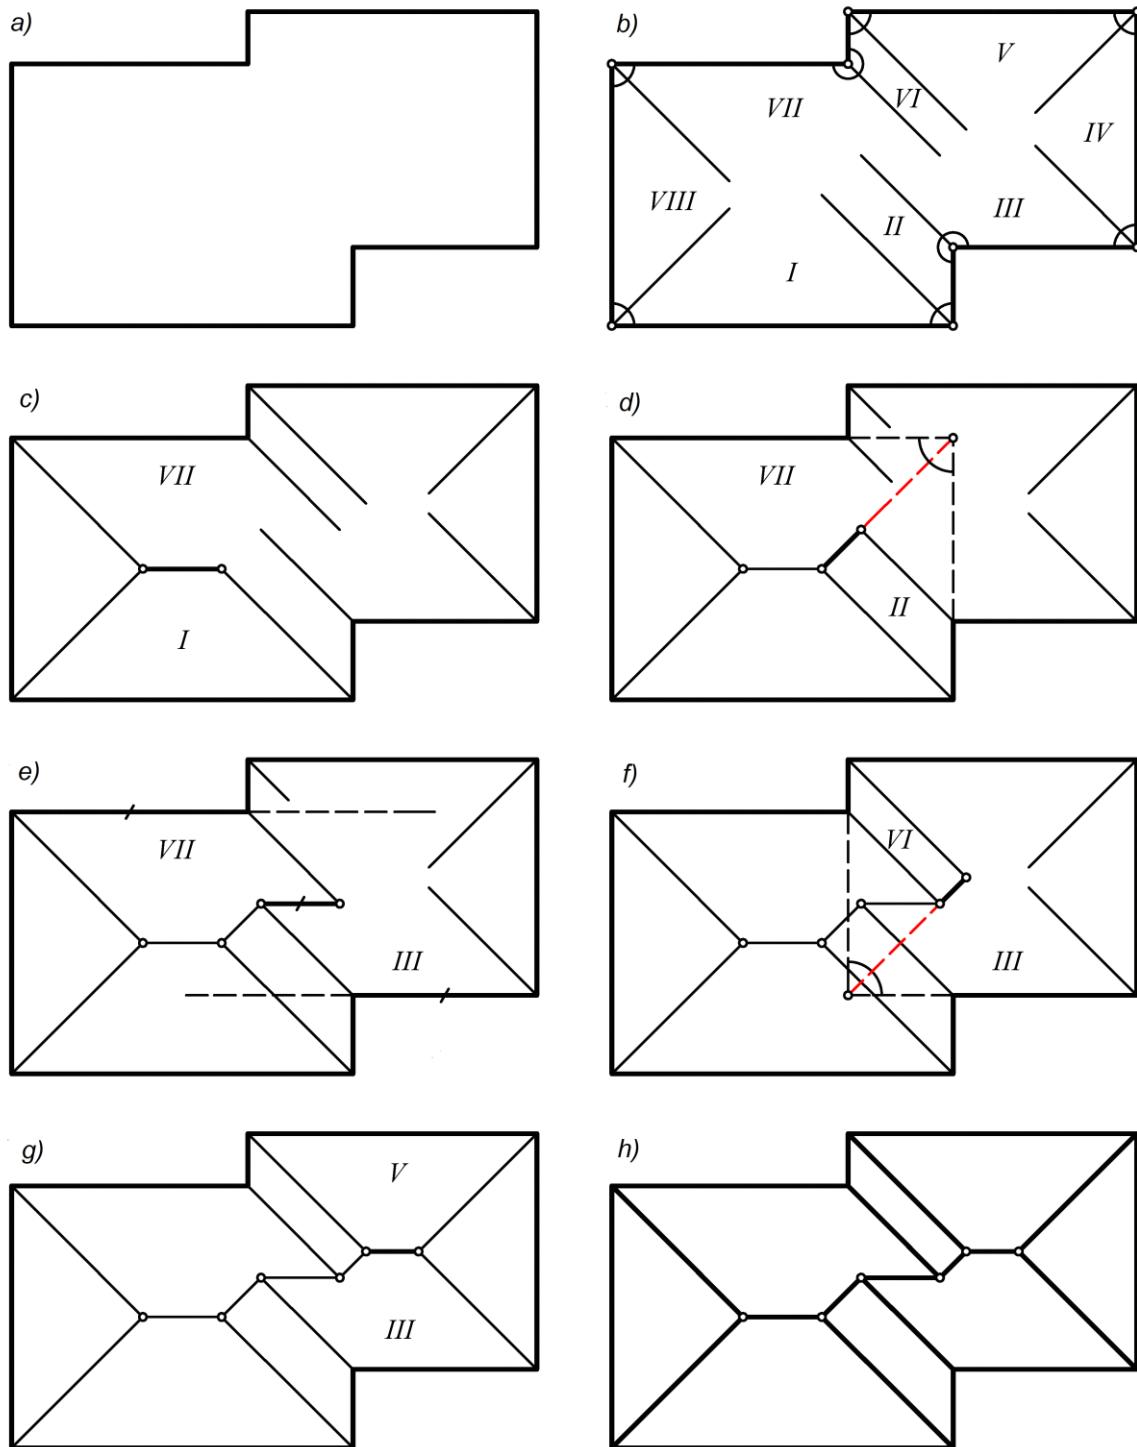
Creation of horizontal projections of intersecting lines of slopes of roof
